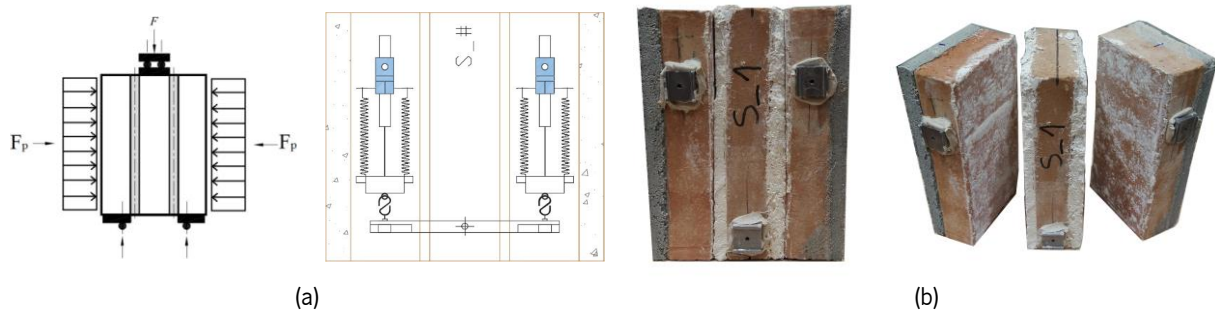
Triplet shear tests: (a) test scheme and setup of the triplets, (b) undamaged and damaged wallet before and after the tests.
